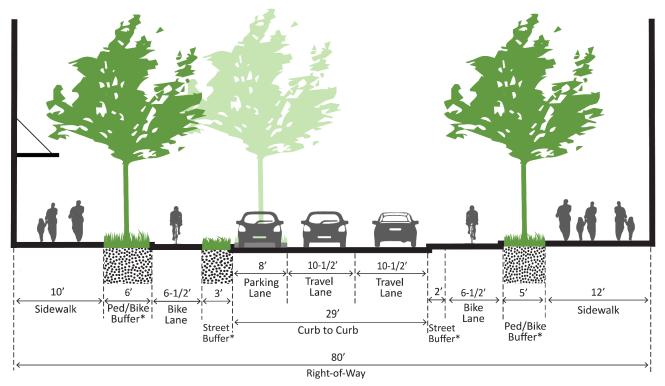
Georgia Avenue (M-8): Wayne Avenue to Blair Mill Road, Looking North
